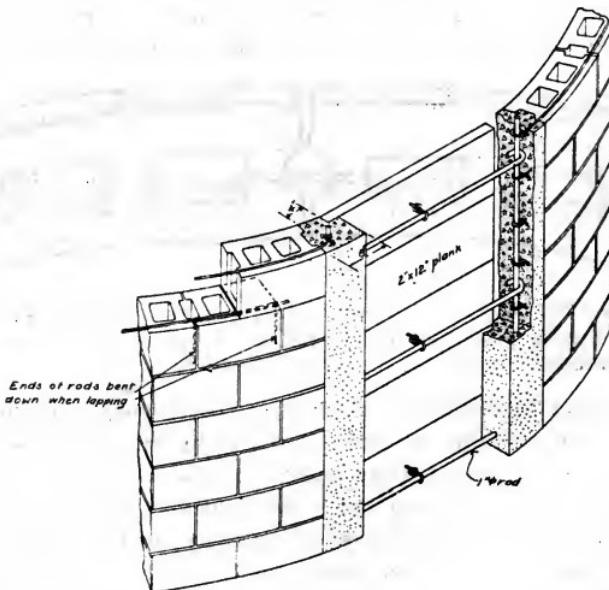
Continuous door opening for concrete block silo. View shows the manner of fastening reinforcing rods to the door frames, also of anchoring rods around a block instead of lapping.
